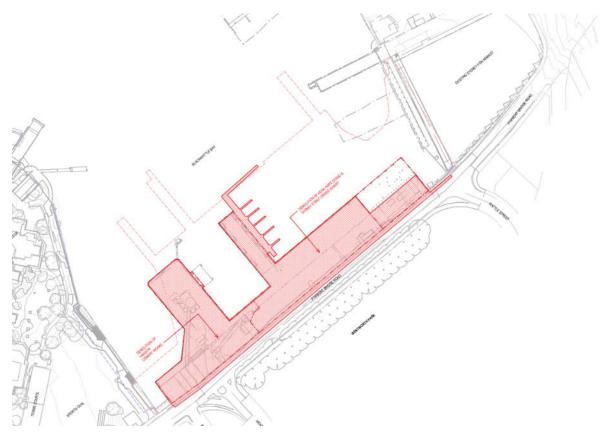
Fish Market demolition site plan (source: Thelem Consulting, Construction Environmental Management Plan, February 2018)
